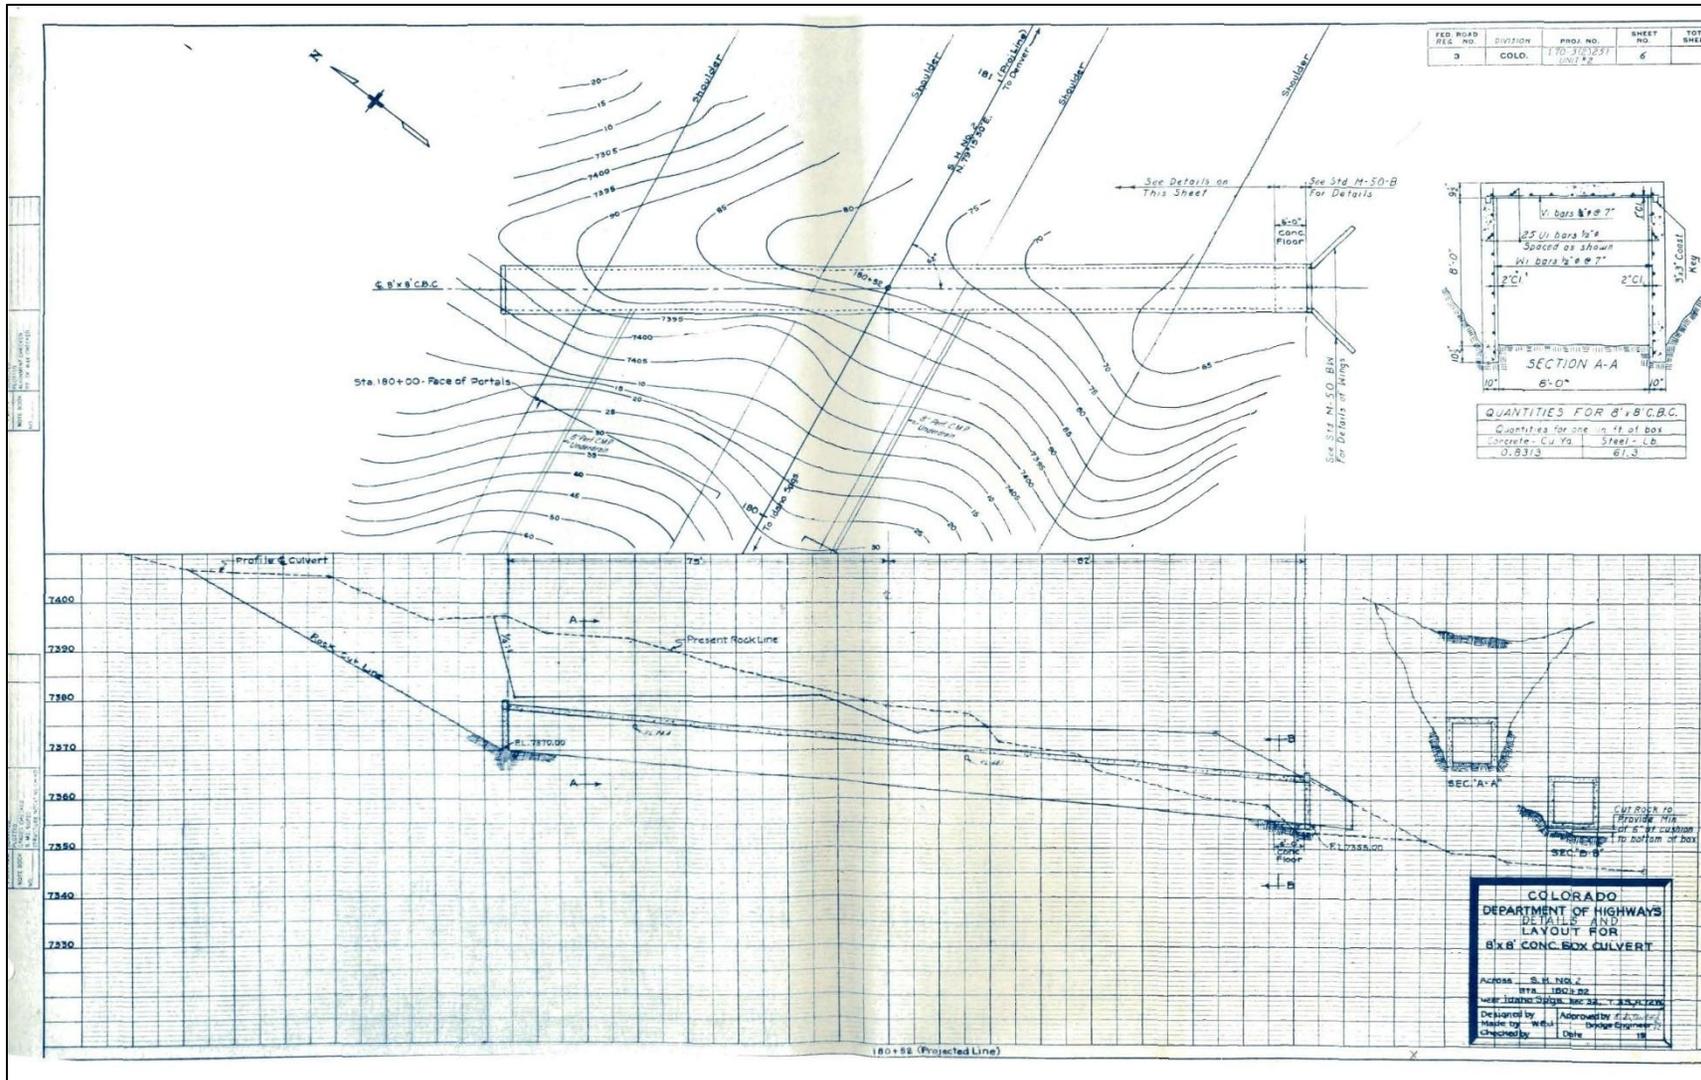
Twin Tunnels As Built Plans (Sheet 6). Details and layout for concrete box culvert.
